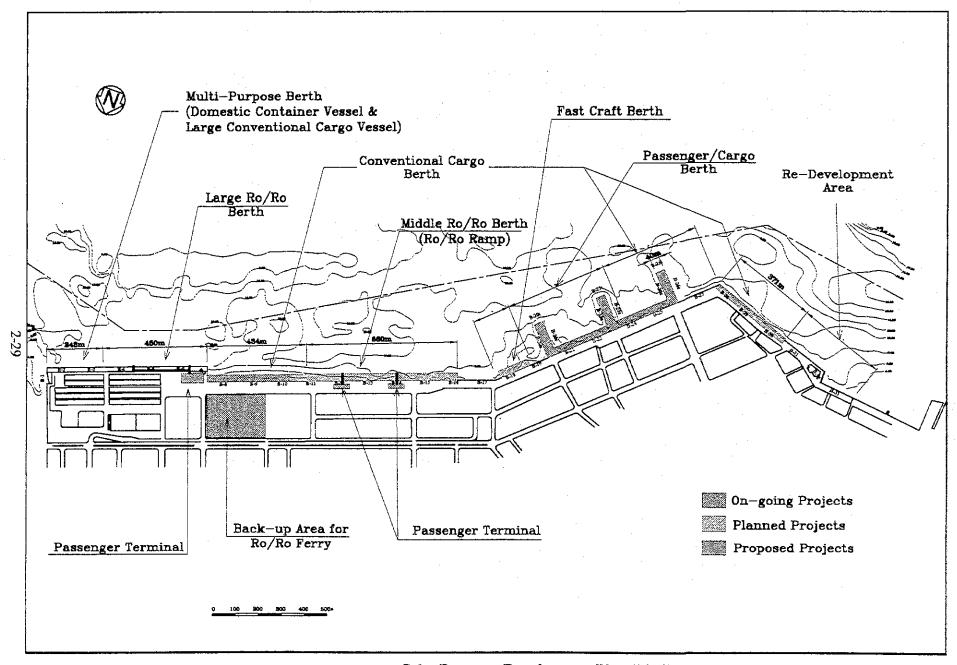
Cebu Baseport Development Plan (2010)
